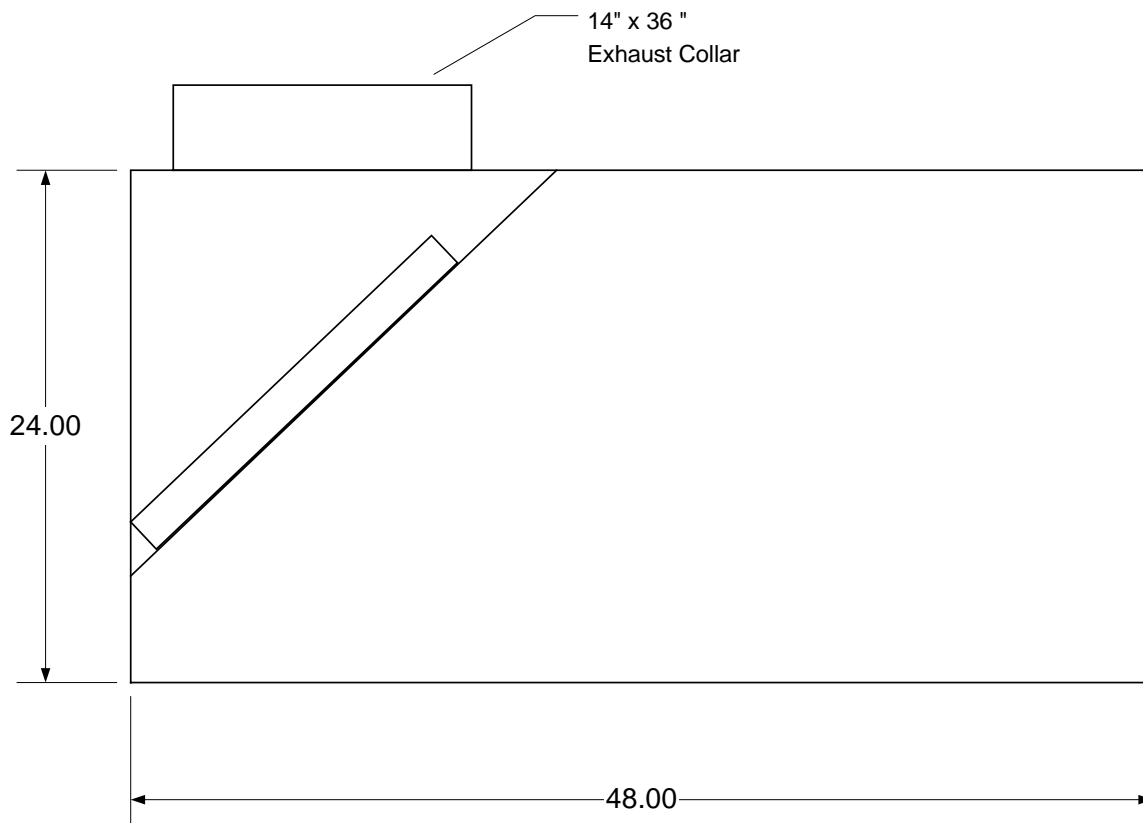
Cross-Section Drawing of the Exhaust Only Canopy Hood
